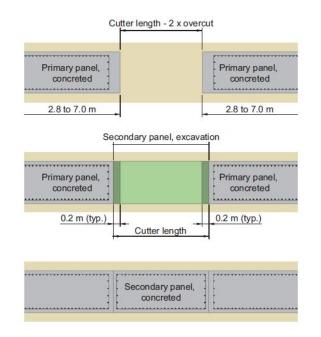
SLURRY WALL CONSTRUCTION SEQUENCE
